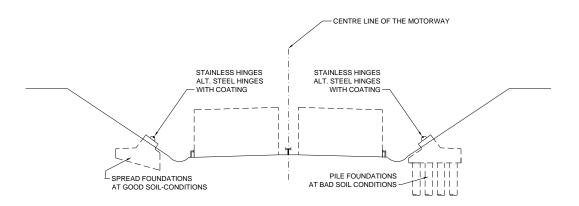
CASE 2-site ready for construction of a hinged arch ecological overbridge
